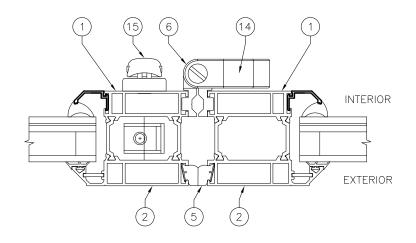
OPEN-IN HINGE JAMB, REVERSE HINGES (6) AND JAMB (3&4) FOR OPEN-OUT
